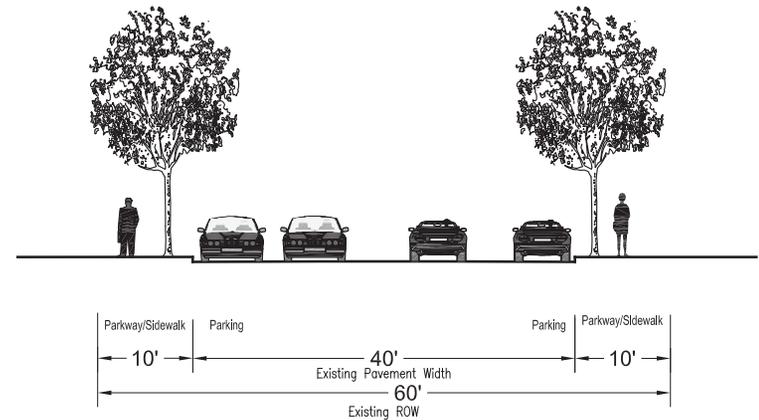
TYPICAL SECTION - PALM AVENUE
